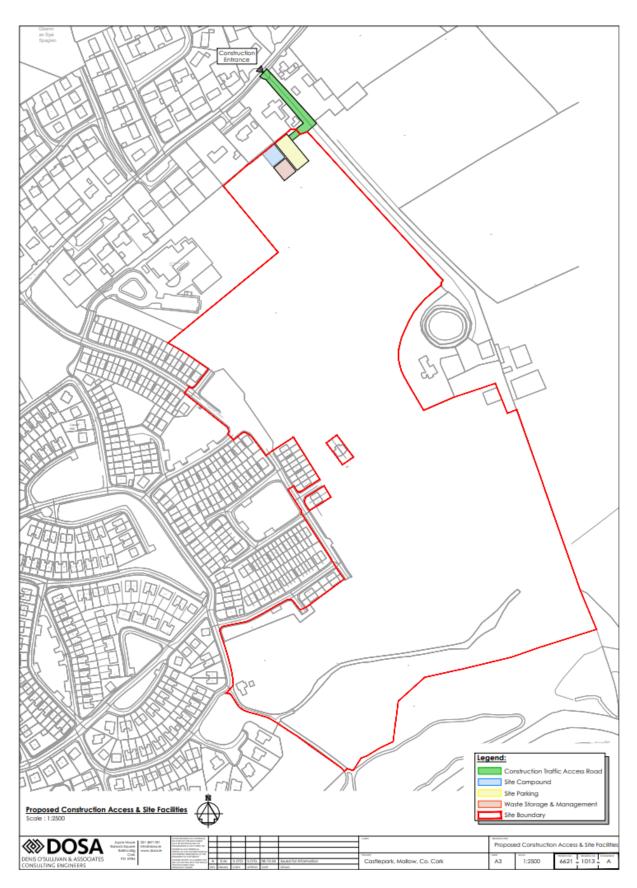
Figure Showing Construction Site Access, Construction Compound, and Waste Segregation Area
